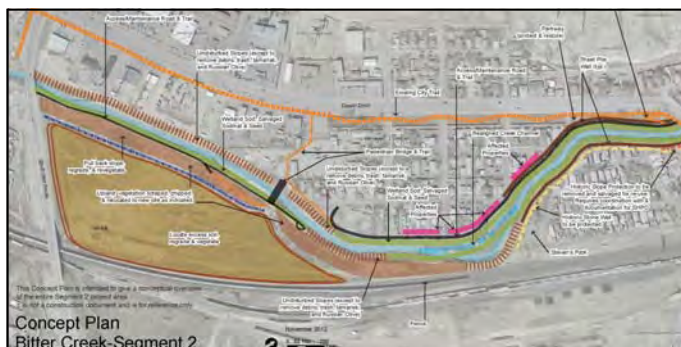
Concept Plan for Bitter Creek Segment Two.
